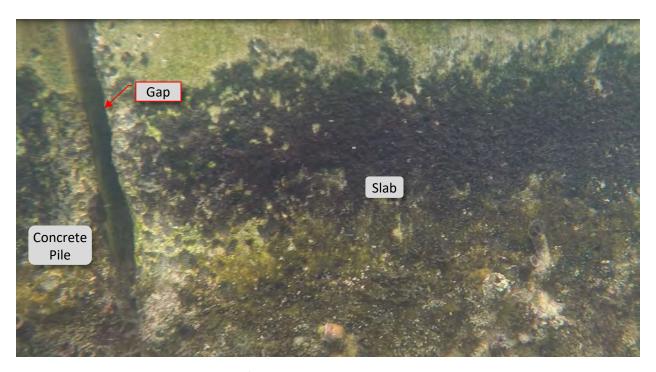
P40. STA 5+80. Gap at construction/expansion joint. Underwater view.
